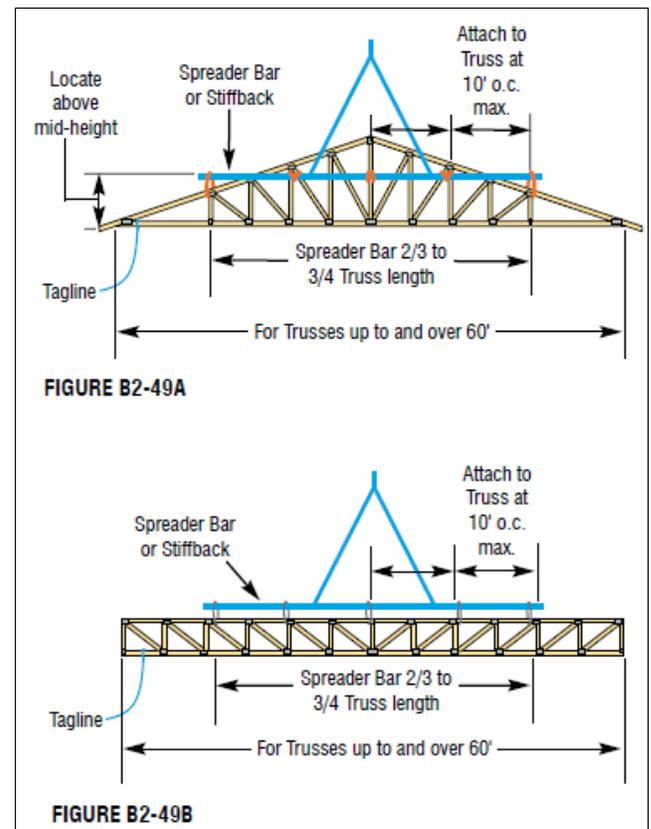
Example of how spreader bars are used for truss hoisting (Source: BCSI Canada).
